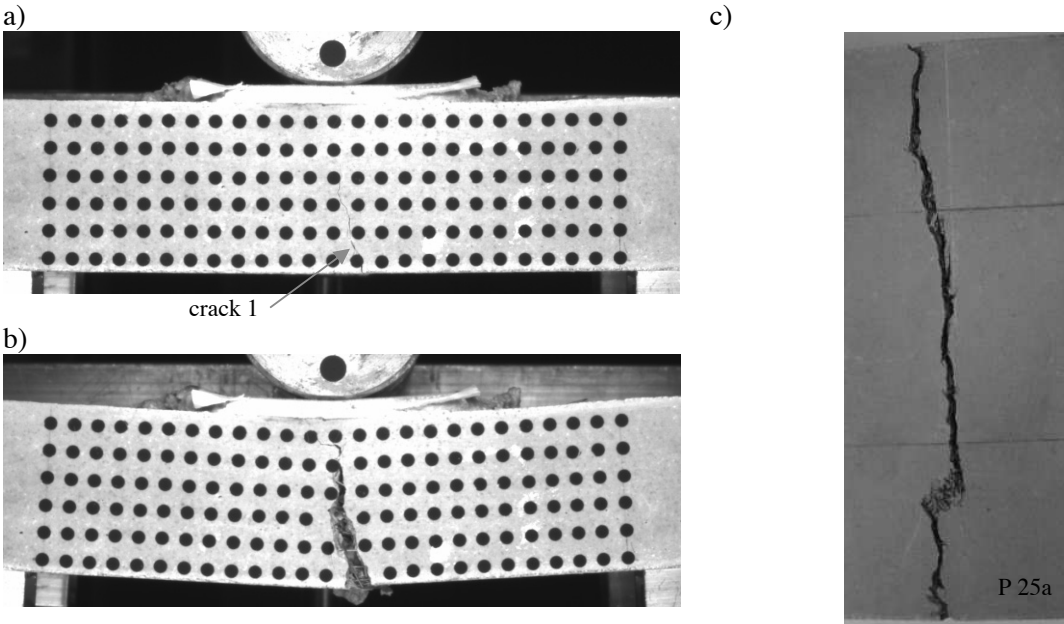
Cracking of the beam: a) crack at P_{max} and b) crack at failure, observed by photogrammetry analysis; c) crack pattern on tensile beam side.
